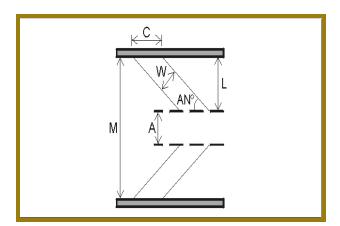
2: Angle Parking Dimensions Angle Parking Dimensions:
